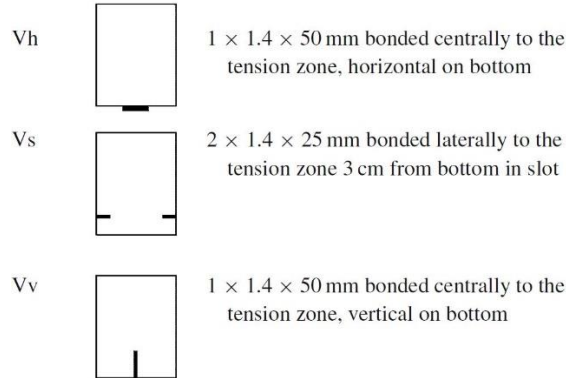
Arrangements of external reinforcement (Vh) and internal reinforcement (Vs and Vv) demonstrated in Schober and Rautenstrauch (2007).
